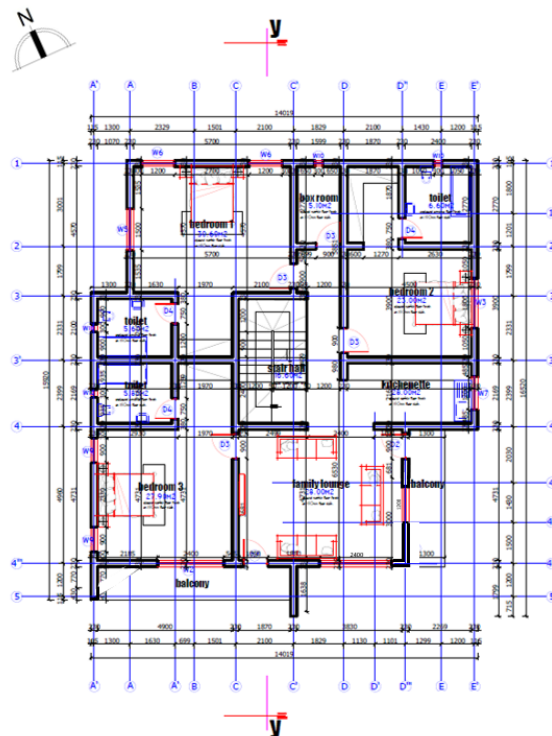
First Floor Plan of a Single Duplex Unit (Block 1) in Case Study One (Ivy Homes)
